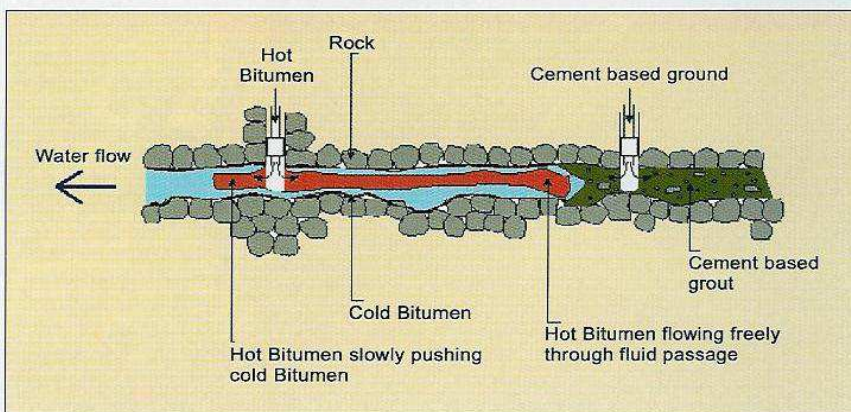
Schematic of Bitumen and Cement Based grout injection at Stewartville Dam. (Lukajic et al [1+1a] and Schönian [5])
